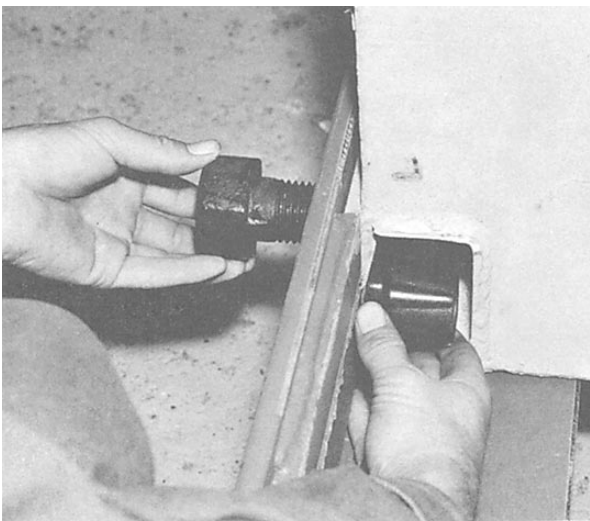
Positioning of A6B bolt and FN1 nut to connect pontoon to assembly angle.
